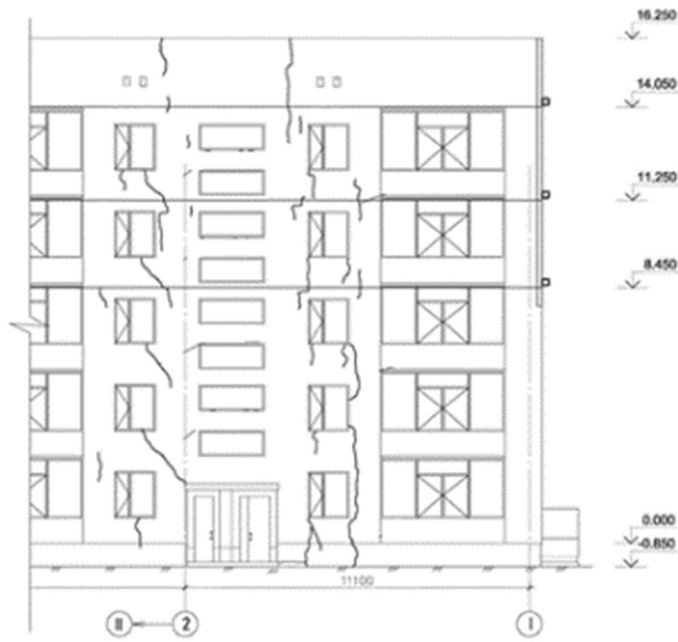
Scheme of defects and damages in the brickwork of the outer walls on the 2-I face, along B axis (left end block section I-II) by the geotechnical monitoring data
